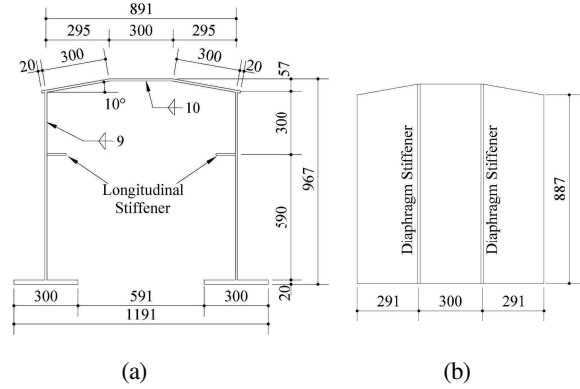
Placement of box girders: Box girder with (a) Model 2F, (b) Model 4F
